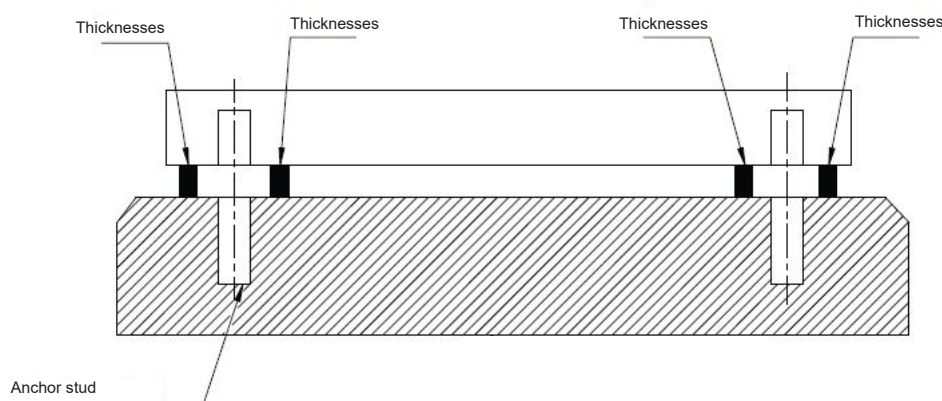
Application of concrete foundations, blade and anchorage
